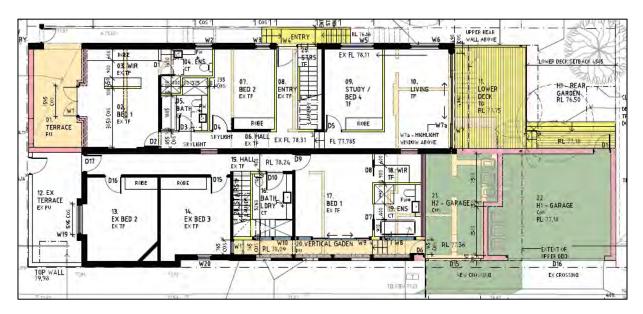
Refused ground floor plan under DA-114/2021 (Source: Edifice Design, 2021)
